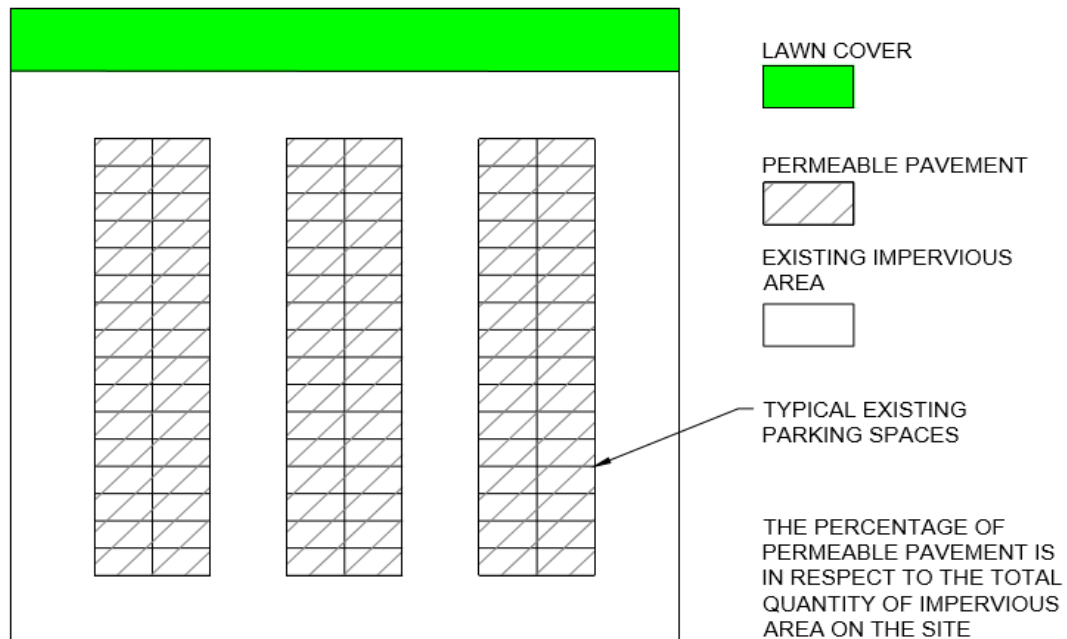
Typical 1 Acre Site with 10% Lawn Cover and 40% Permeable Pavement
